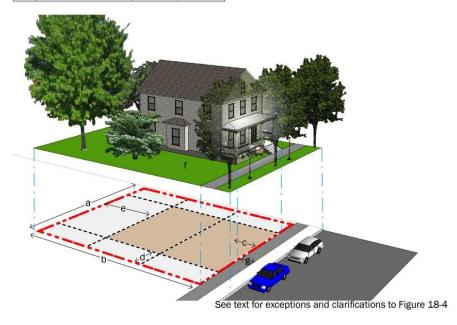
Lots That Do Not Front on Main Street or East Main Street
